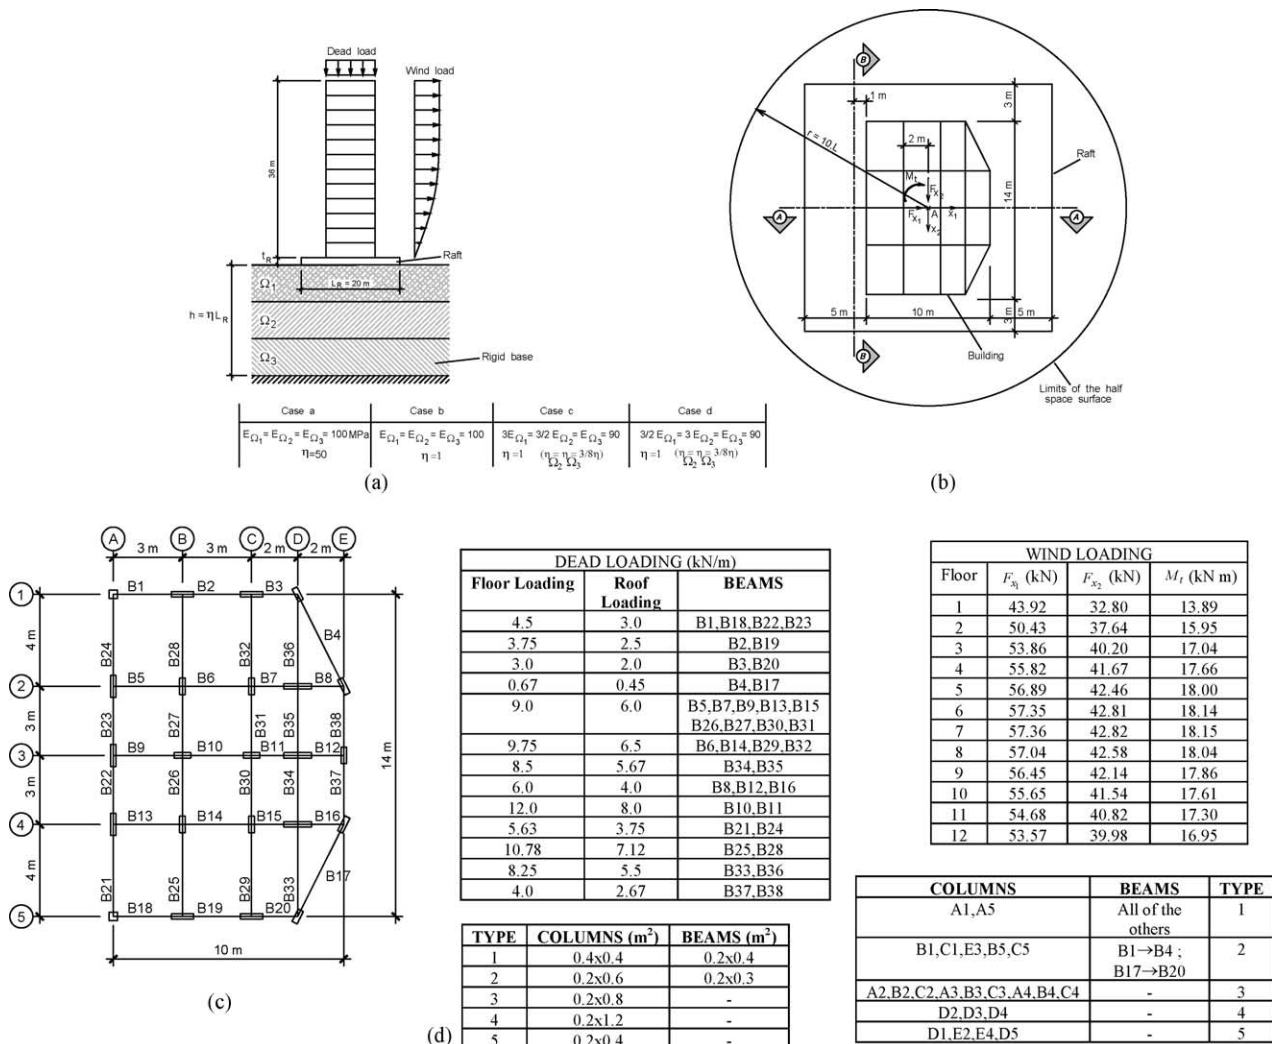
(a) Configuration of the structural scheme and the cases considered. (b) Schematic plan of the raft-building model. (c) Floor plan of the building. (d) Tables of the forces and dimensions of the building's linear elements.
